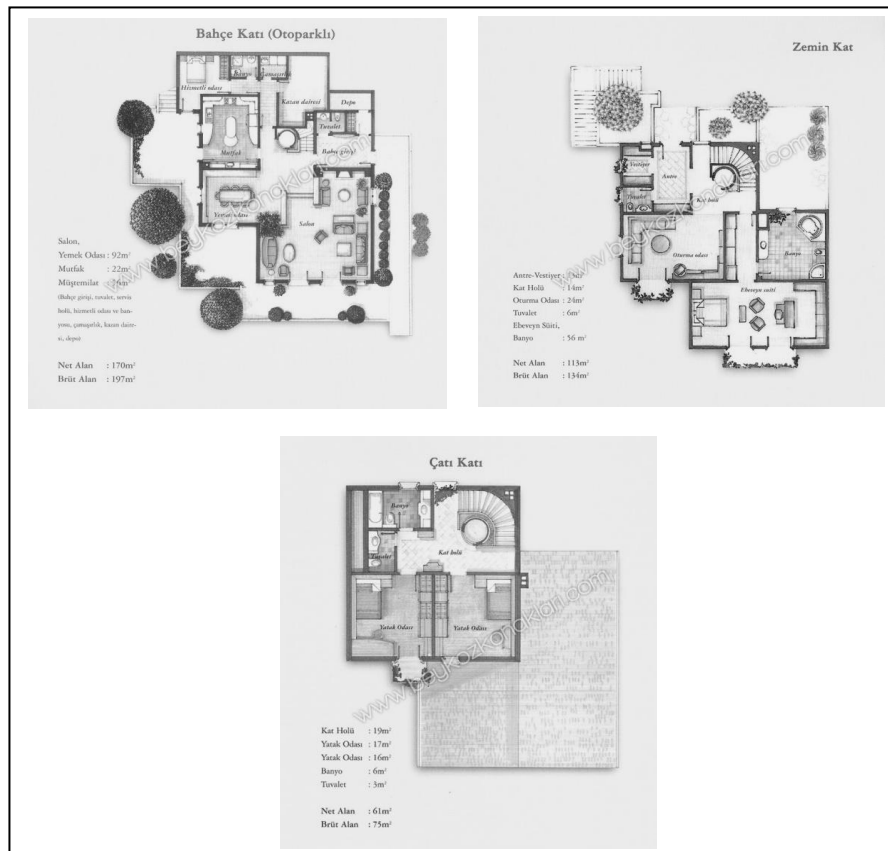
Floor plans of Beykoz mansions, Fatih Ergökmen, 2000s [98]
